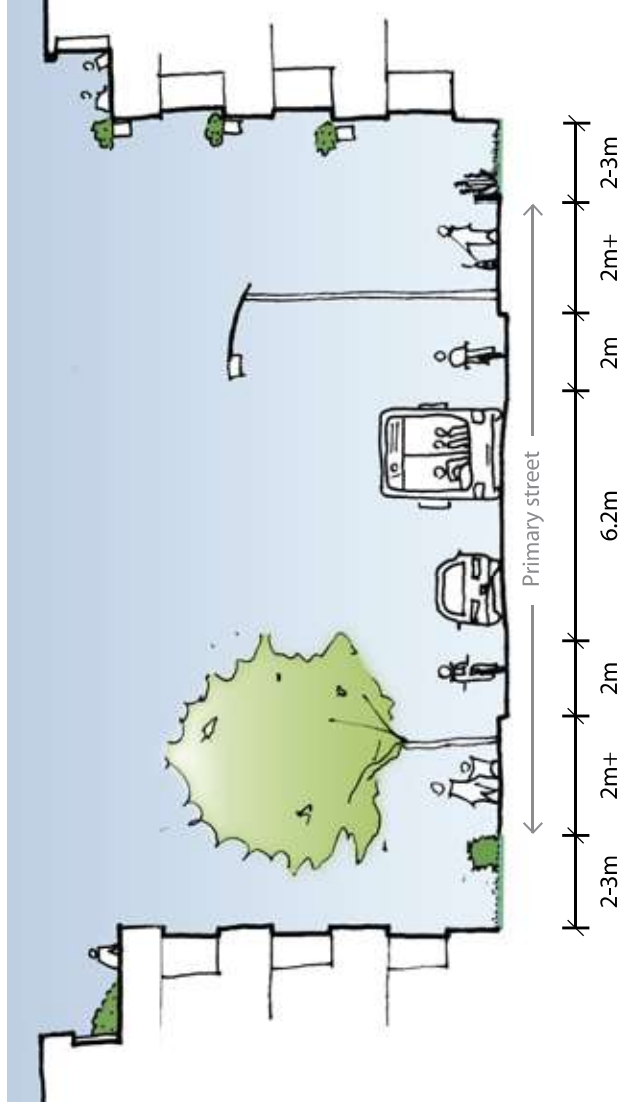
A-A - typical primary street cross section (refer to Figure 15 for section location)
